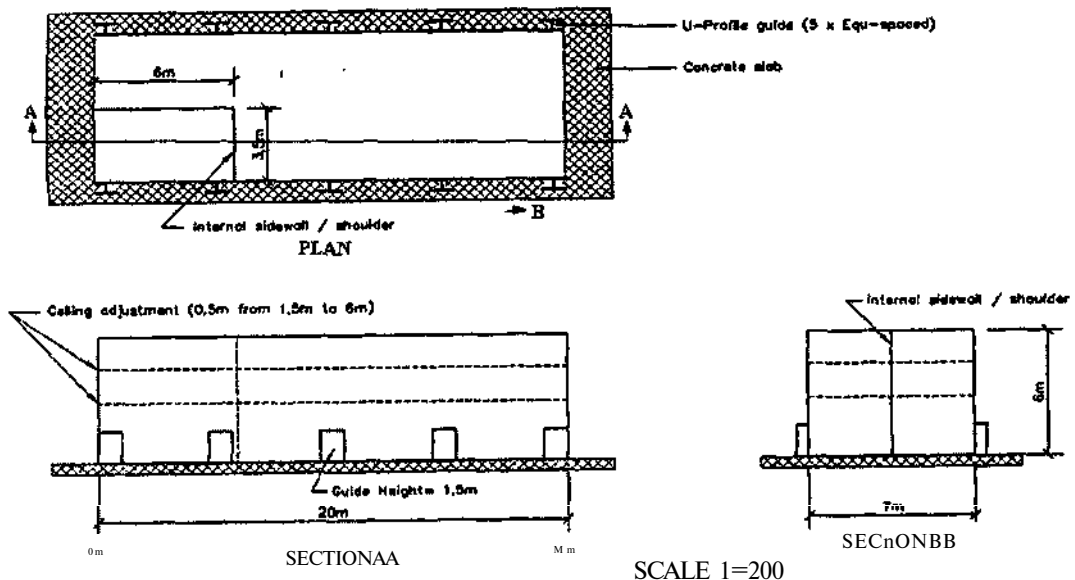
Test tunnel (du Plessis and Bryden, 1997)
